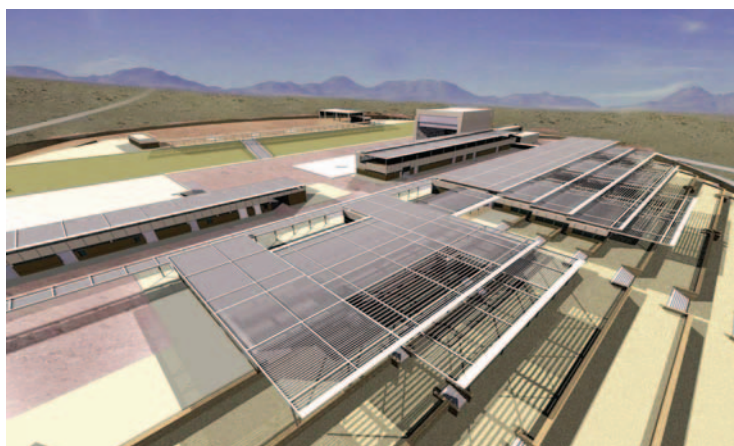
Birds eye view over the proposed design for the future OSF building. The large telescope assembly hall can be seen in the back.
